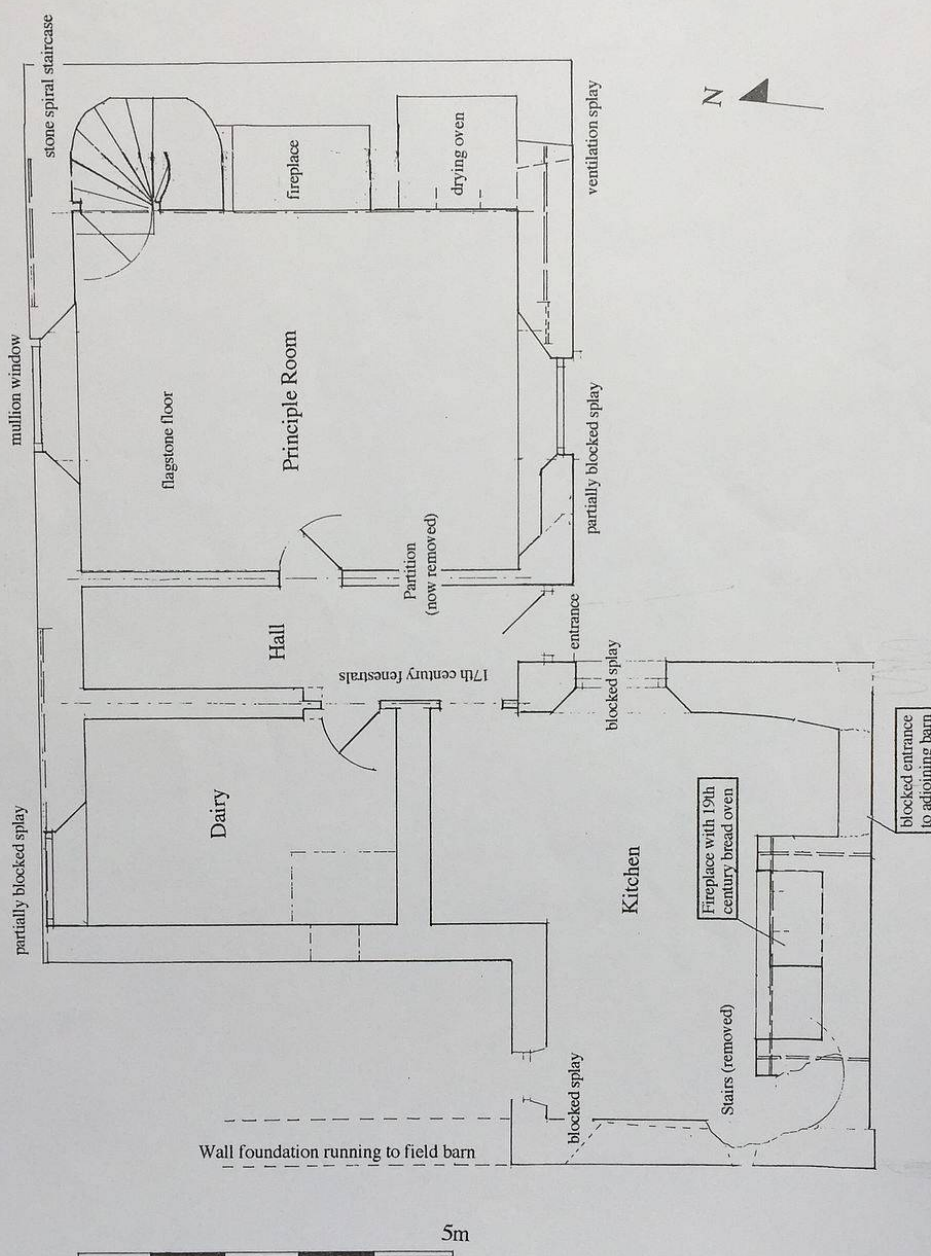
GROUND FLOOR PLAN OF THE PIKE'S FARMHOUSE
